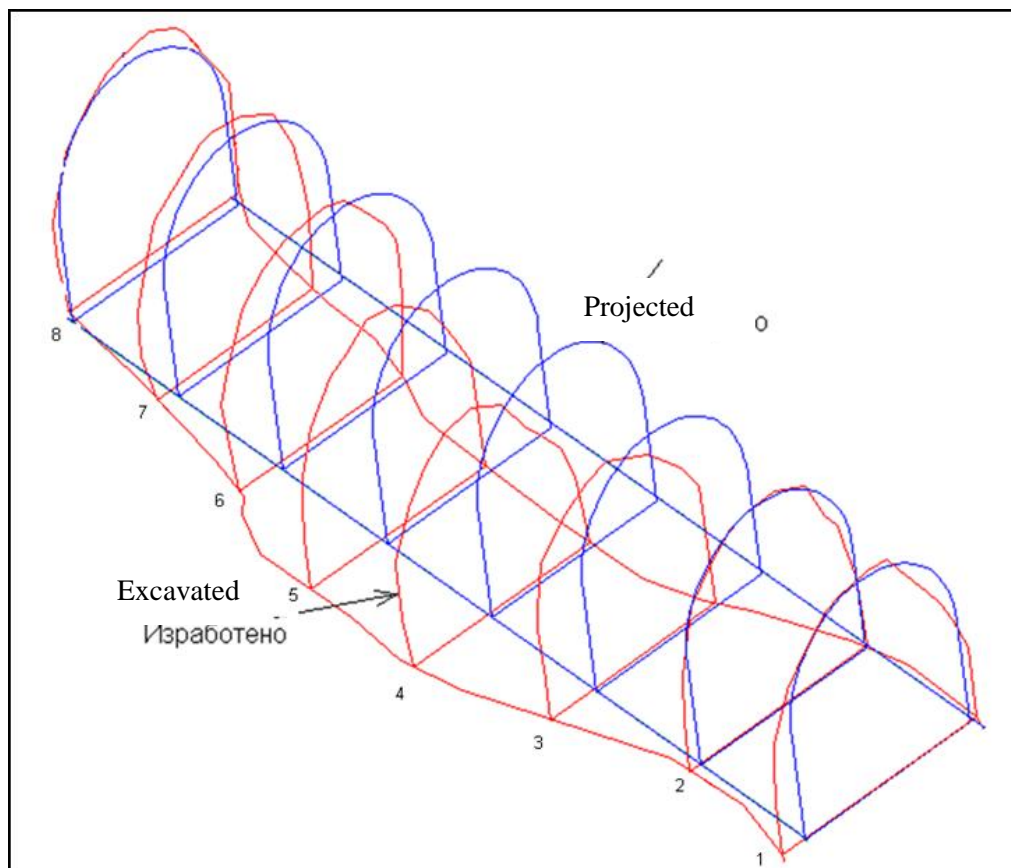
Location of planned and excavated facilities profile in rock type – gneiss (every 2.5 m) with existing technology
